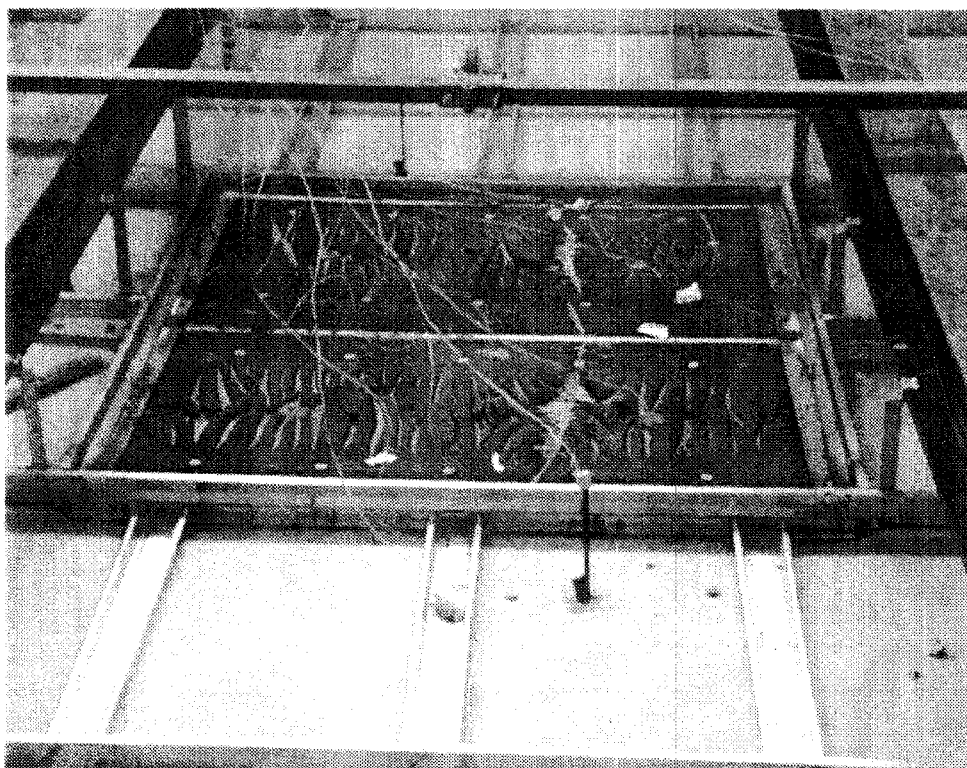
Cracking of plasterboard backing of door leaves
